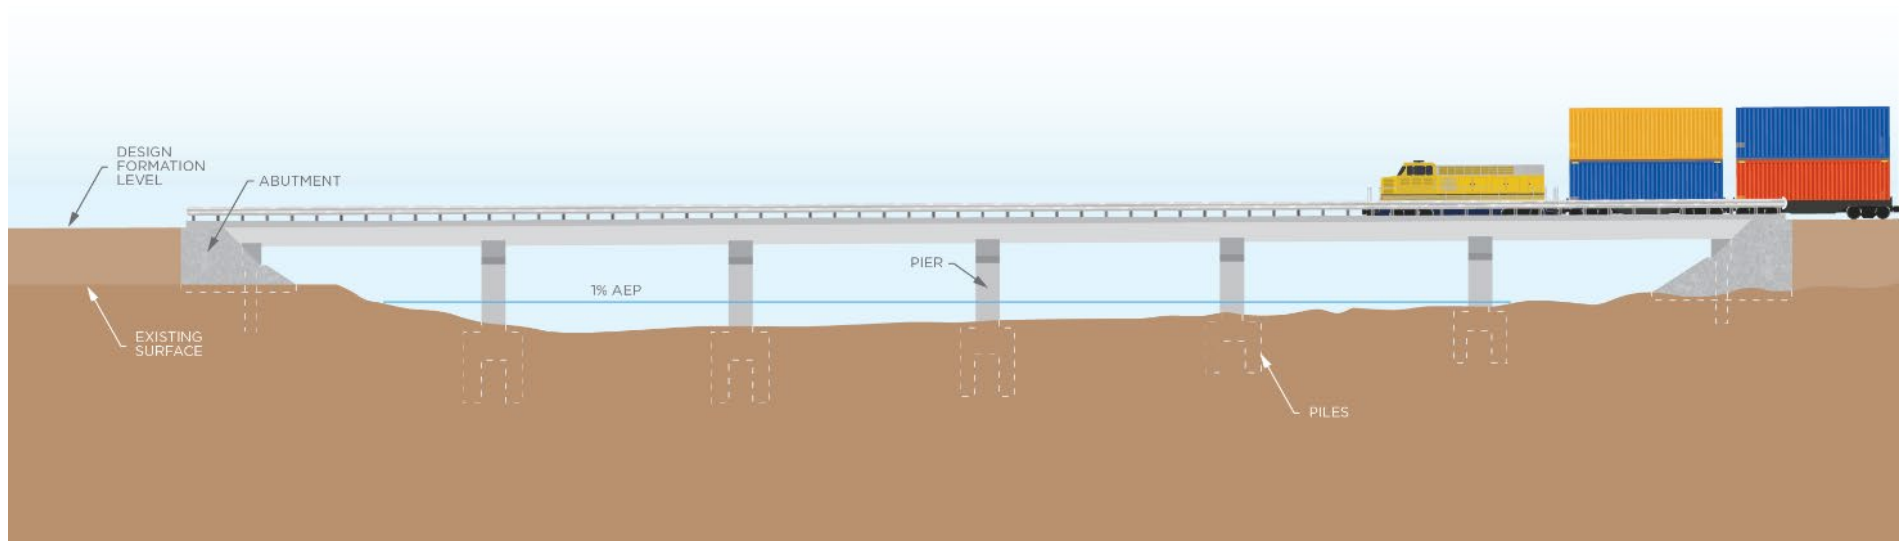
TYPICAL SECTION OF RAIL-OVER-WATERCOURSE BRIDGE STRUCTURE
